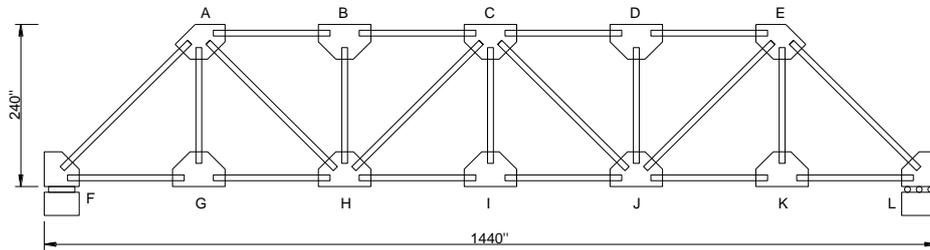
Geometric dimensions of the Warren type bridge truss (Ganz 2012)
